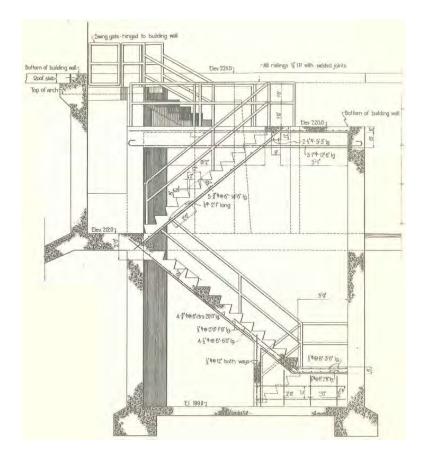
Reservoir Adjacent to Control Building/Pump Station (Source: Section H-H on Sheet 11 of 1936 design drawings by Stevens & Koon)
